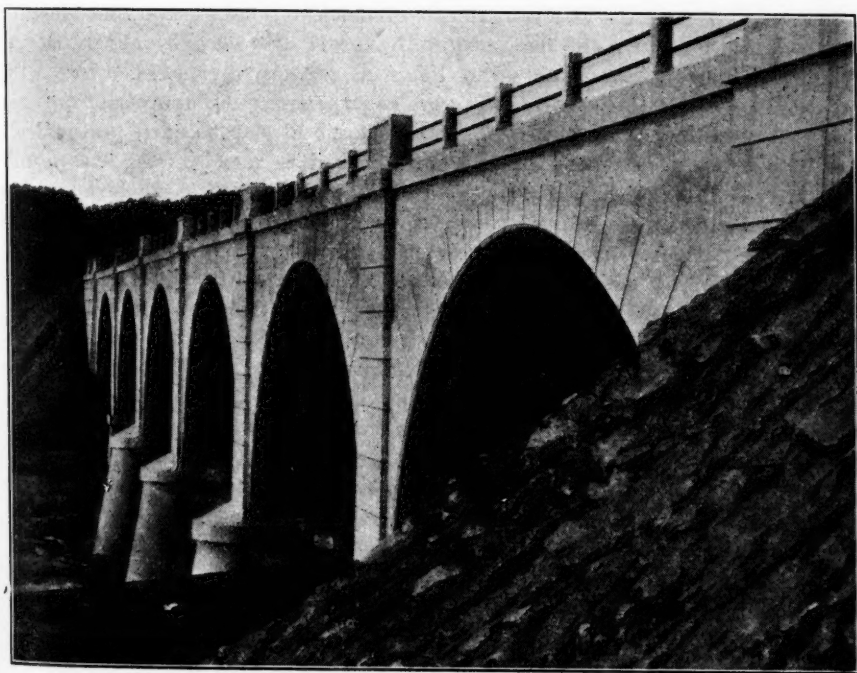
TYPE OF REINFORCED CONCRETE ARCH BRIDGE CONSTRUCTION USED ON RAILROAD RE-LOCATION.
